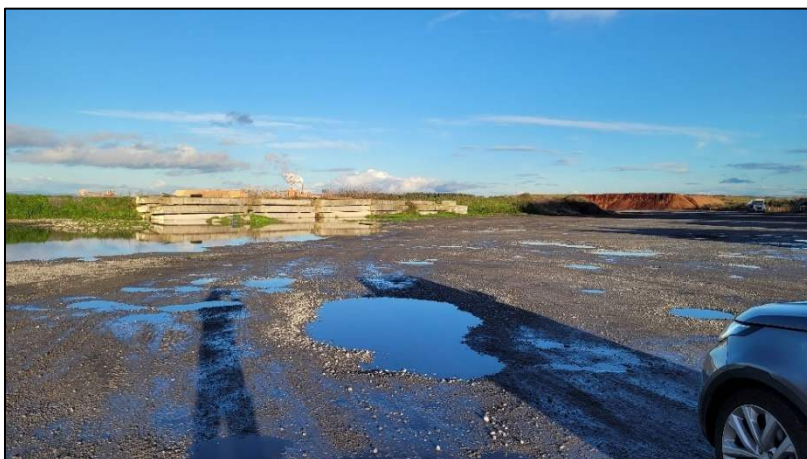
View looking northeast towards north-western shoreline of Foynes Island at proposed MAC Area A – [P.N 10/11/2025]
